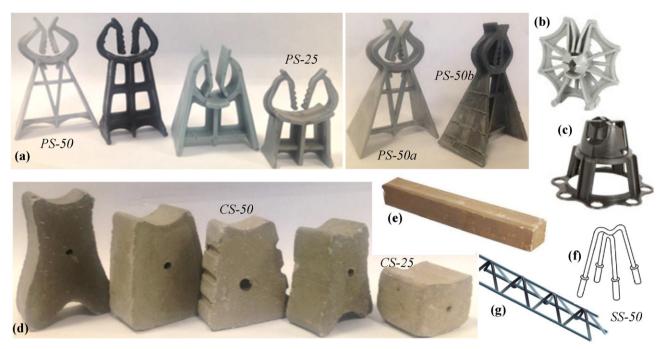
Typical examples of spacers used in reinforced concrete: a) plastic clip-on "A" shaped, b) plastic wheel/circular, c) plastic tower, d) cementitious single spacer, e) cementitious line/ bar spacer, f) steel wire chairs and g) steel wire continuous lattices.
